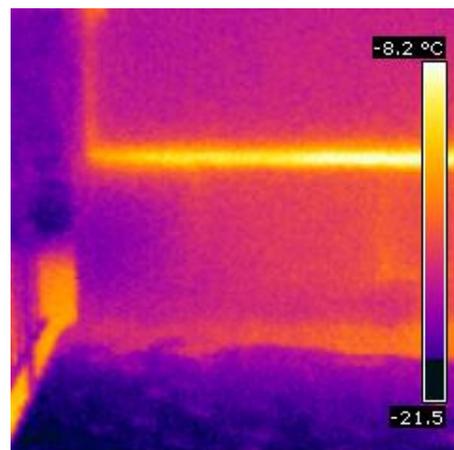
I.R. image of the thermal bridge created by the basement wall
